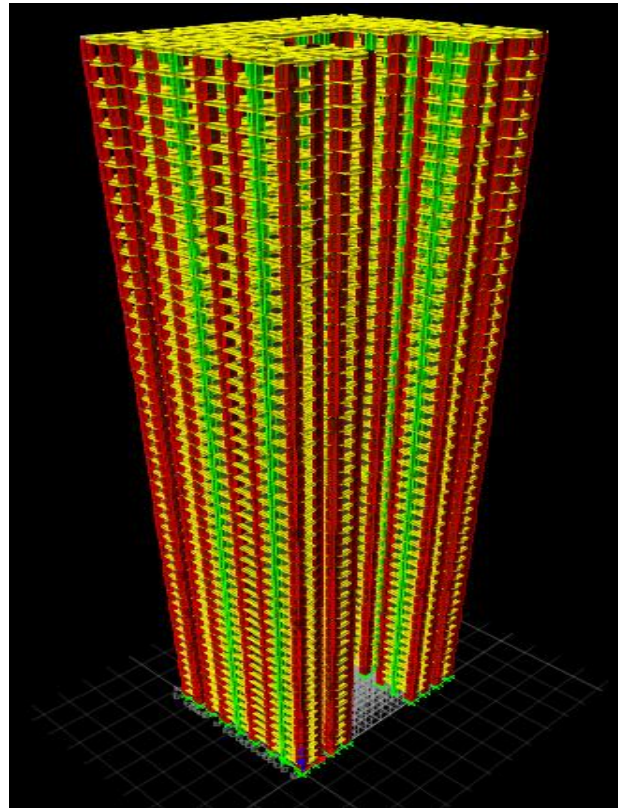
ELEVATION (MODEL NO 3 - SHEAR WALL STRUCTURE WITH "L" SHAPED SHEAR WALL ARE PLACED AT CORNERS)
